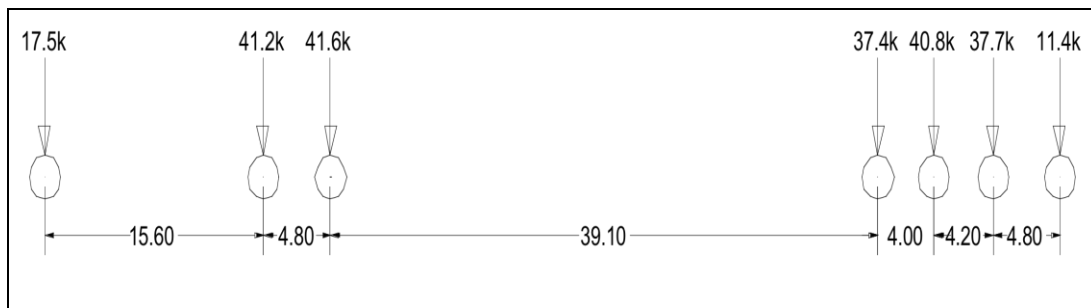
Extreme heavy truck observed at Doremus Avenue Bridge on 5/11/04 (weights are in kips, spacing in feet)
